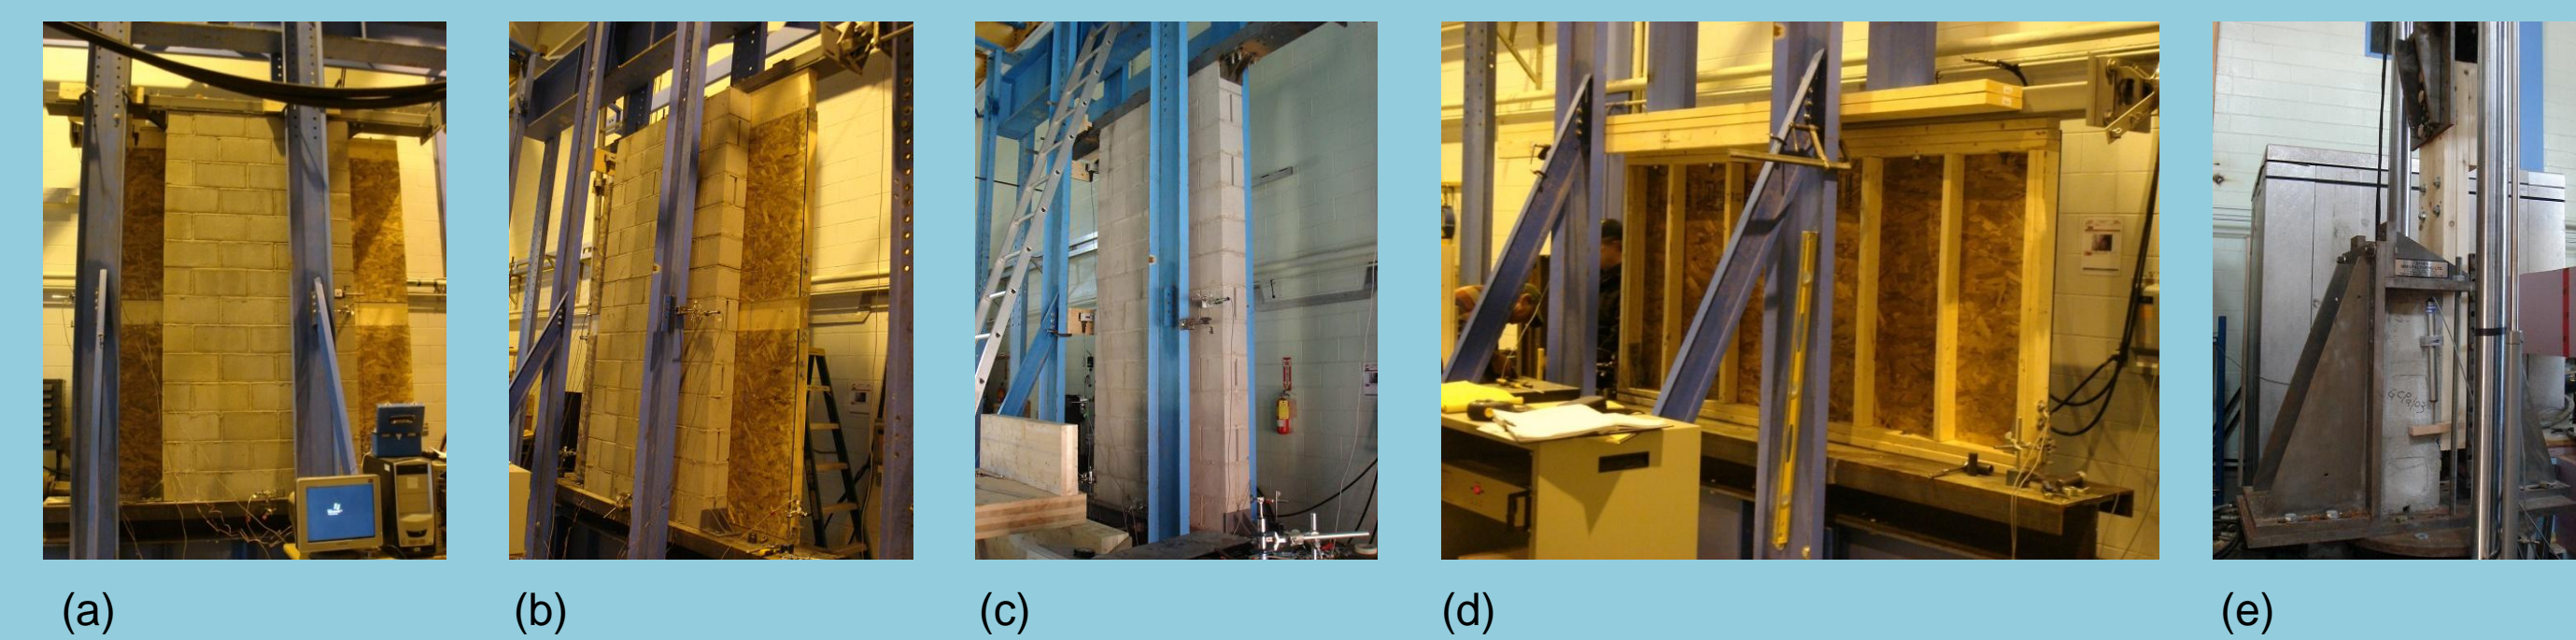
Test set up: (a) hybrid wall one; (b) hybrid wall two; (c) two-storey masonry wall; (d) one-storey wood wall; (e) wood-masonry connection
